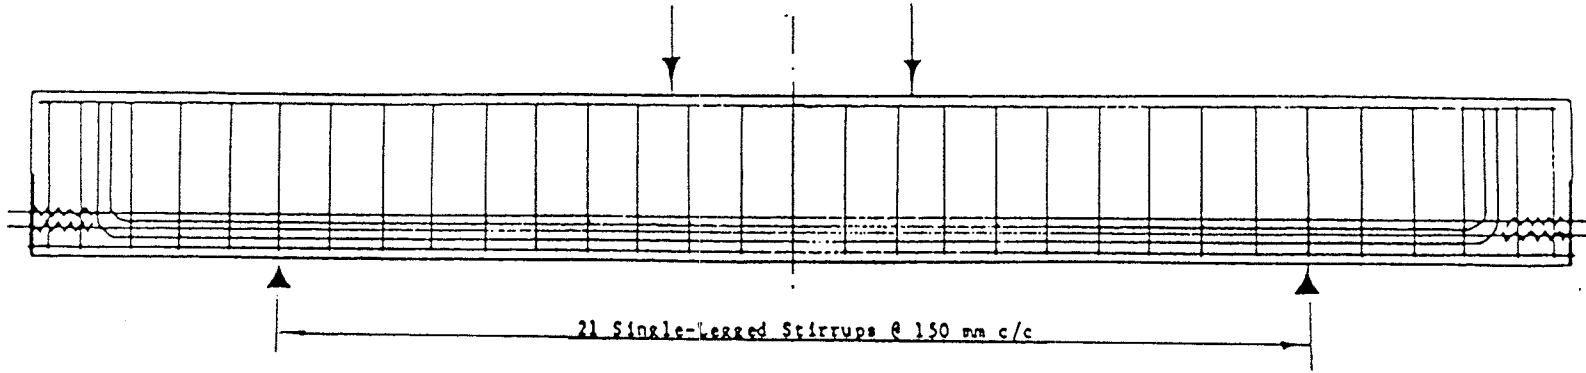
Beam PSN5-S6M with Single-Legged Stirrups
